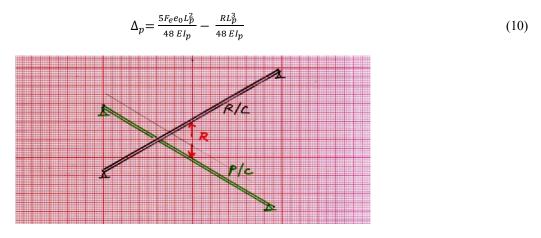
Crossing of prestressed concrete and reinforced concrete beams
